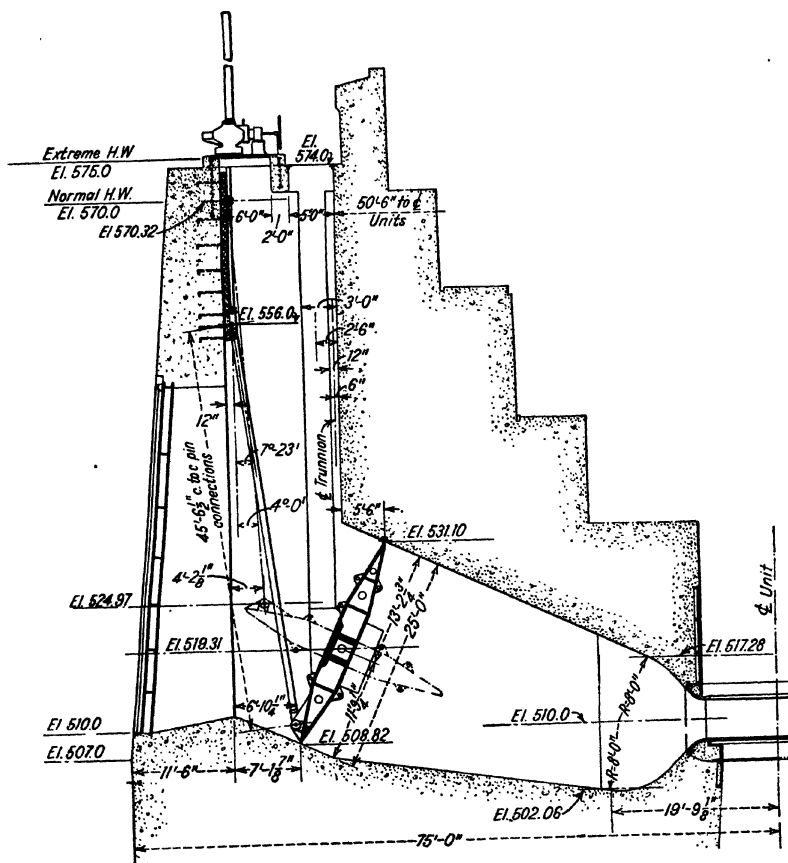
Typical Section Showing Arrangement of "Lee" Headgate.
